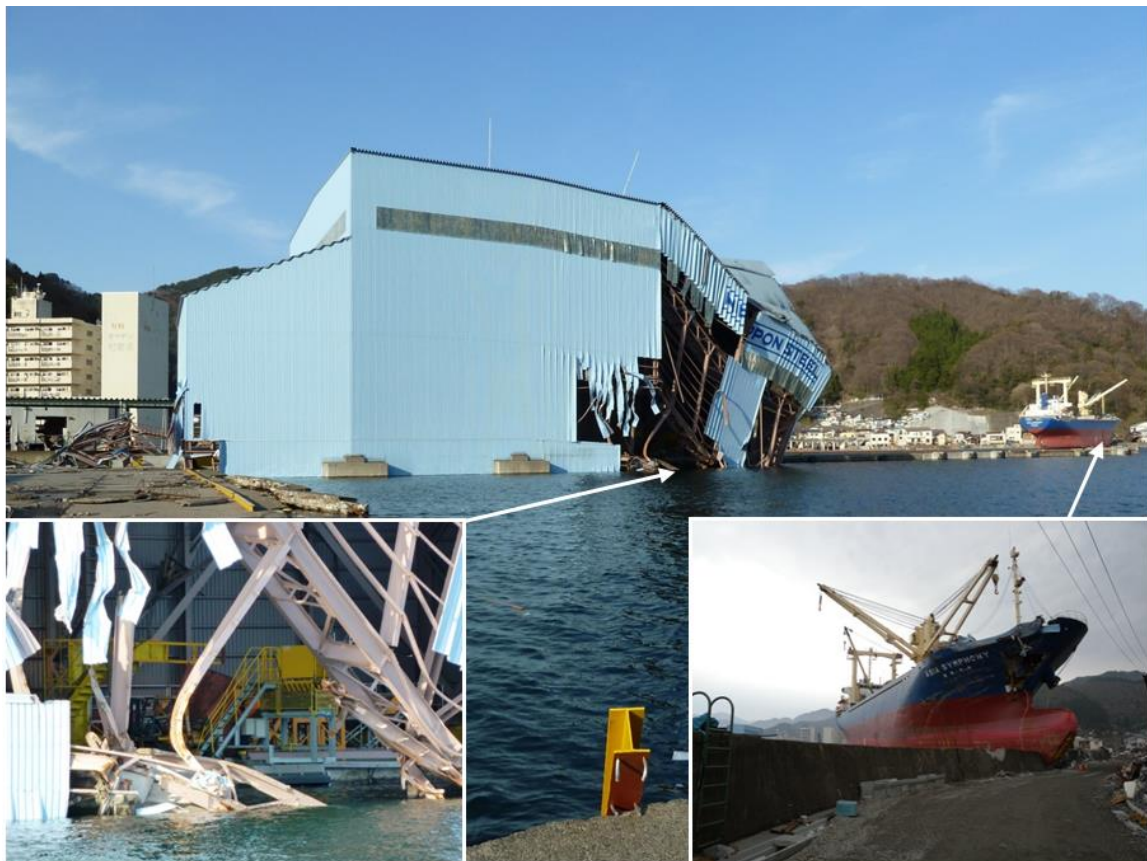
Ship impact damage to port building in Kamaishi, Japan.
